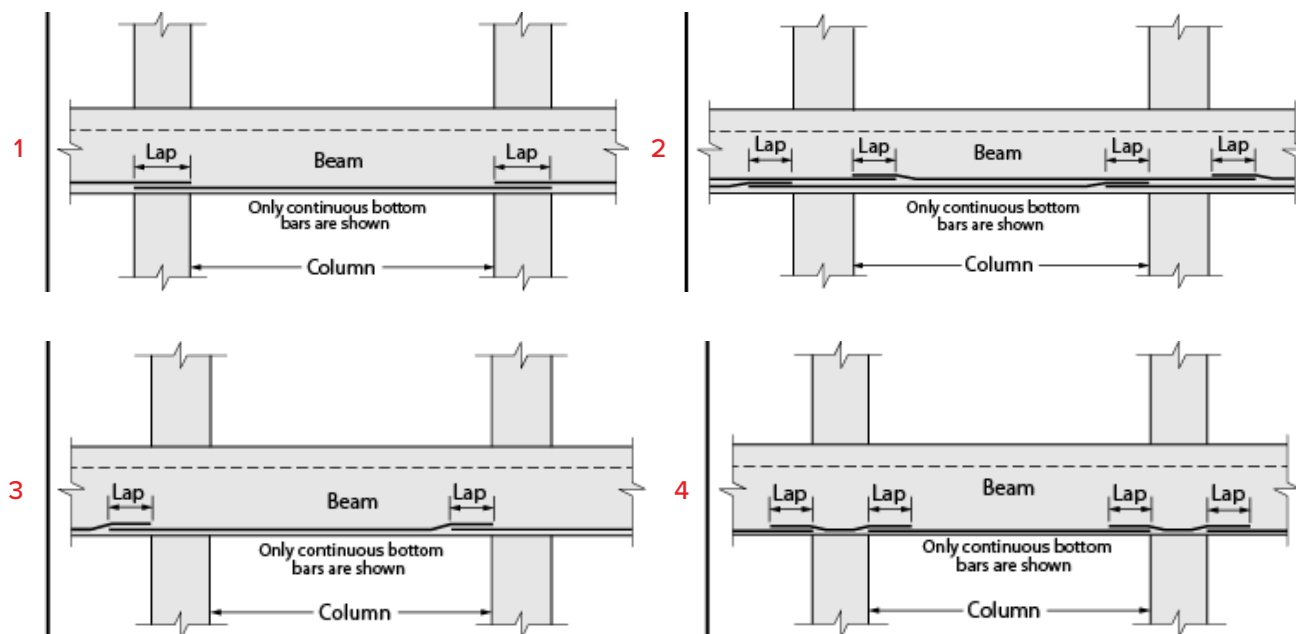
Potential options for lap splices of continuous bottom reinforcing bars in beams. (Image courtesy of Concrete International, December 2009, Beam-Column Joints, and CRSI Reinforcing Bars: Anchorages and Splices, 2022.)
